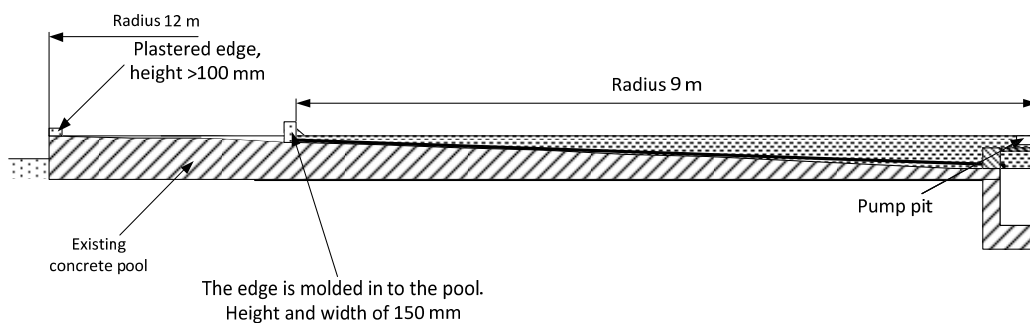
A cross section (half symmetry) of the original concrete pool and the new modified fire test pool.
